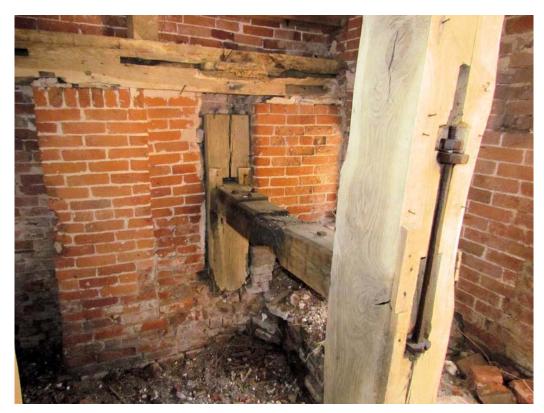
Detail of Hurst Structure for South Wheel Gearing and Structural Beam, Looking South.
